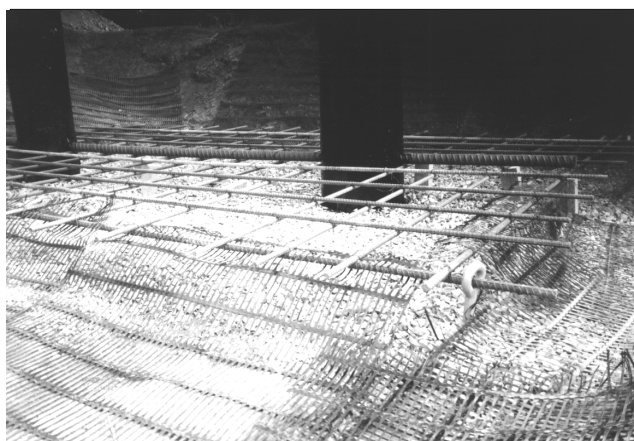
"Bobkin" connection between Tensar® UX-1400 geogrid and perimeter #8 rebar. *Photo courtesy of Mr. Bob Jonas.
